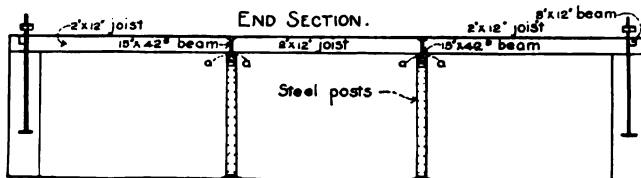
End section of steel frame of barns of Mr. F. E. Dawley.
